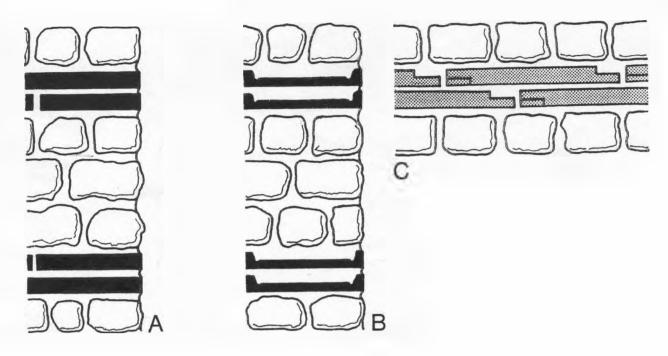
Use of bricks to form bonding courses in Roman rubble stone walling: section (A); and substitution of *tegulae* for bricks in such walling: section (B) and elevation (C).
